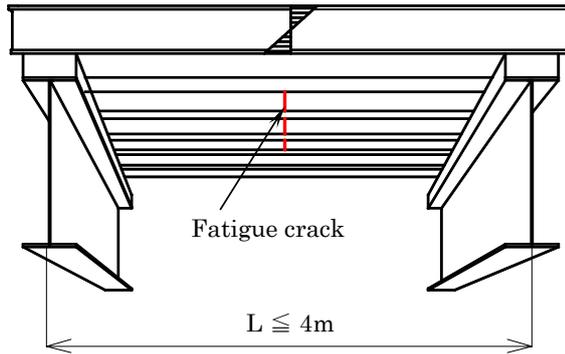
Fatigue crack initiated on bottom flanges in the bridge-longitudinal direction
